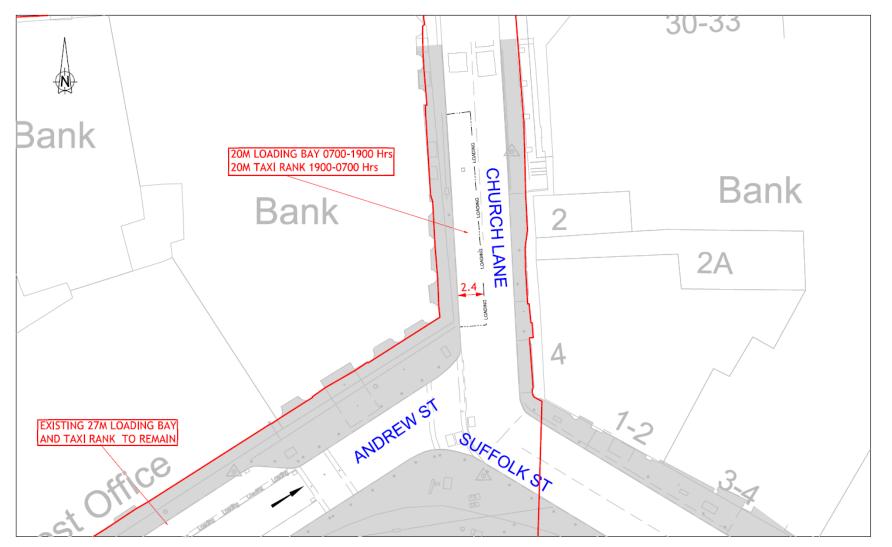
Road Design Detail- St. Andrew's Street, Church Lane
